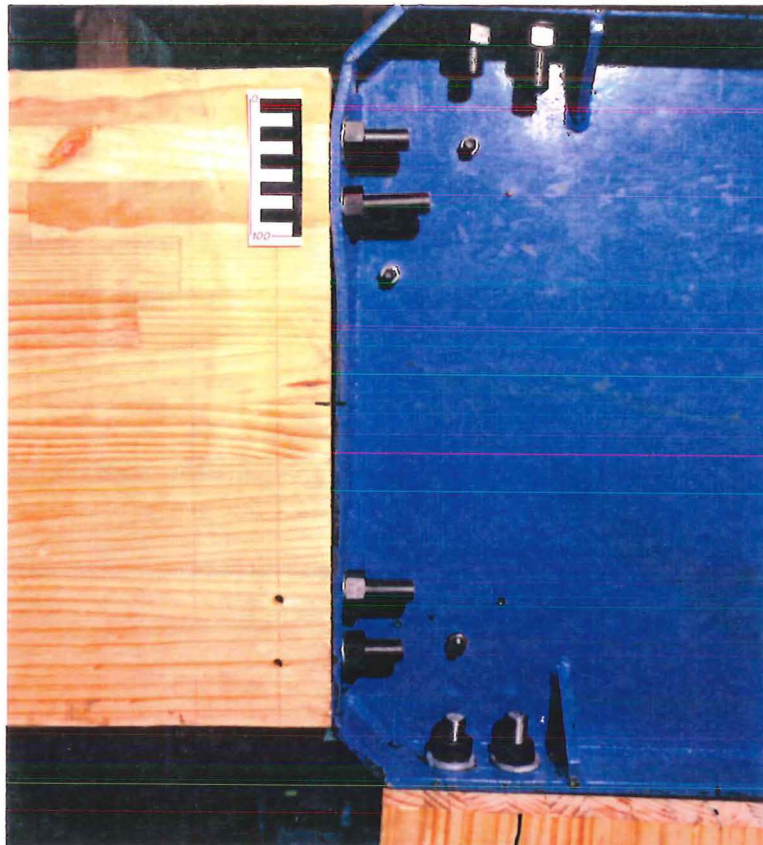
View of Unit 5 steel joint showing the buckling of the beam flanges
